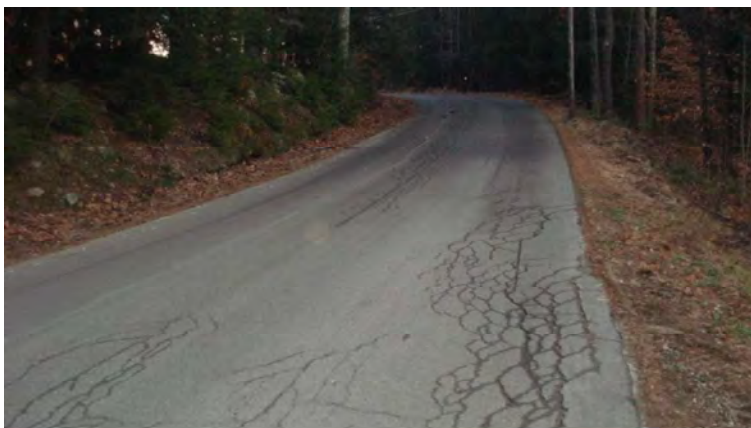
Woodman Road, Drainage to Proposed BMP 31
